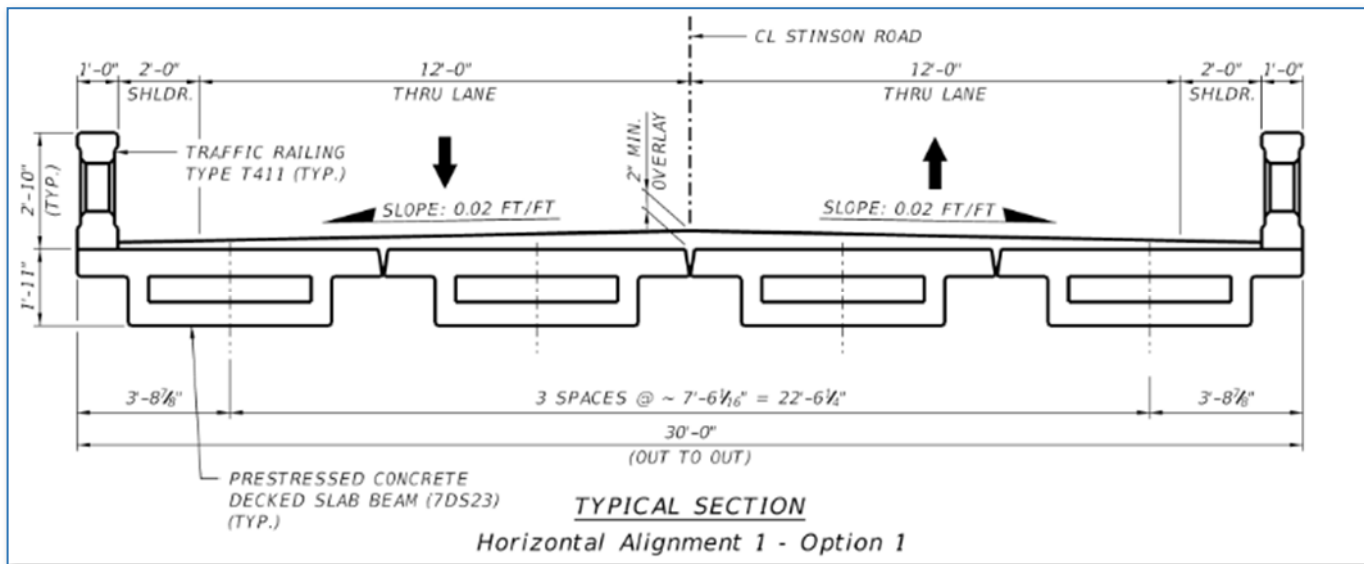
TxDOT Prestressed Concrete Decked Slab Beams (7SB23) Typical Section
